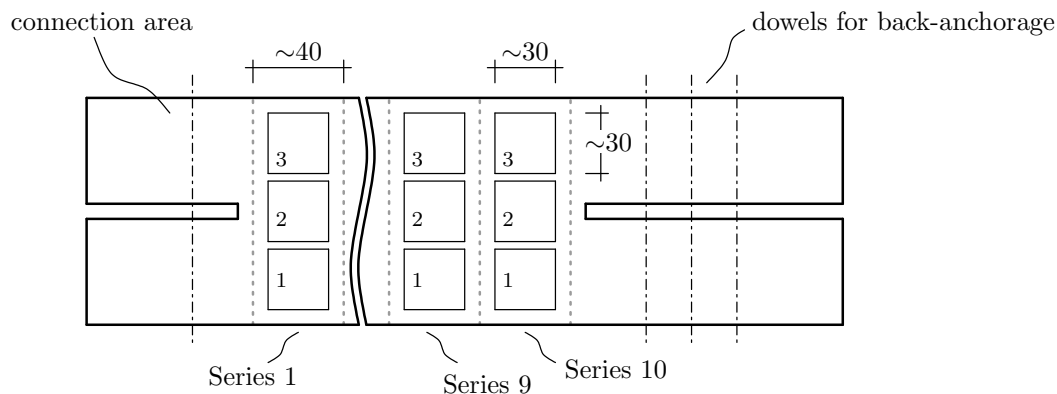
Preparation of specimens: Position of test series and specimens (dimensions in mm).
